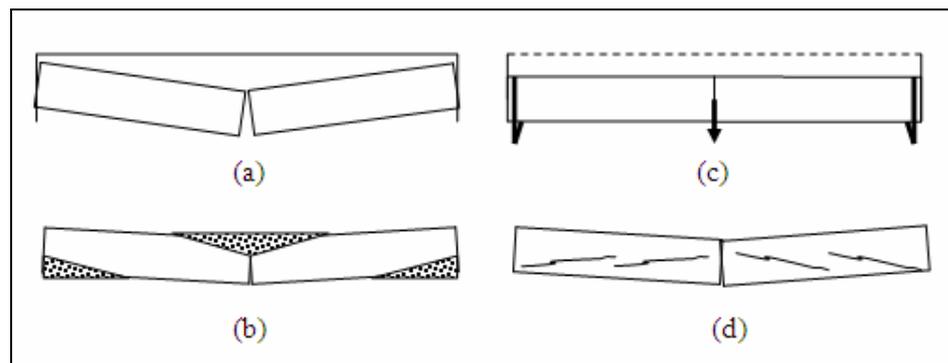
Failure mechanisms of voussoir beam (a) snap-through, (b) crushing, (c) sliding, (d) diagonal cracking
